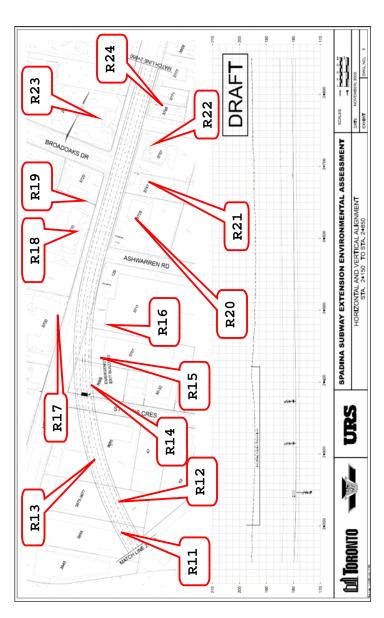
PLAN AND PROFILE OF THE PROPOSED SUBWAY ALIGNMENT
